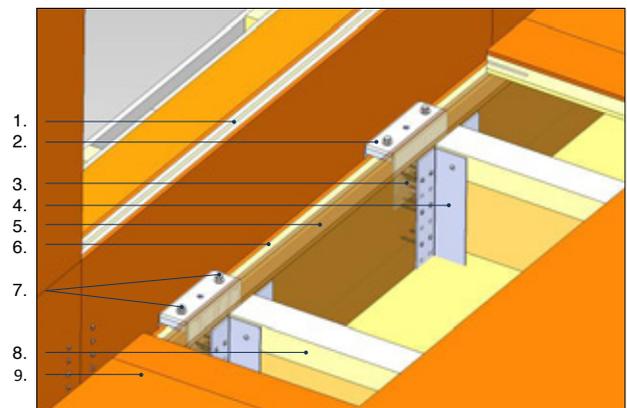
Wall junction connection between external wall (left) and internal wall (right) using steel angle brackets and screw connectors. The angle brackets transfer part of the wind induced up-lift forces to the external wall, introducing a more efficient load transfer at wall junctions.
